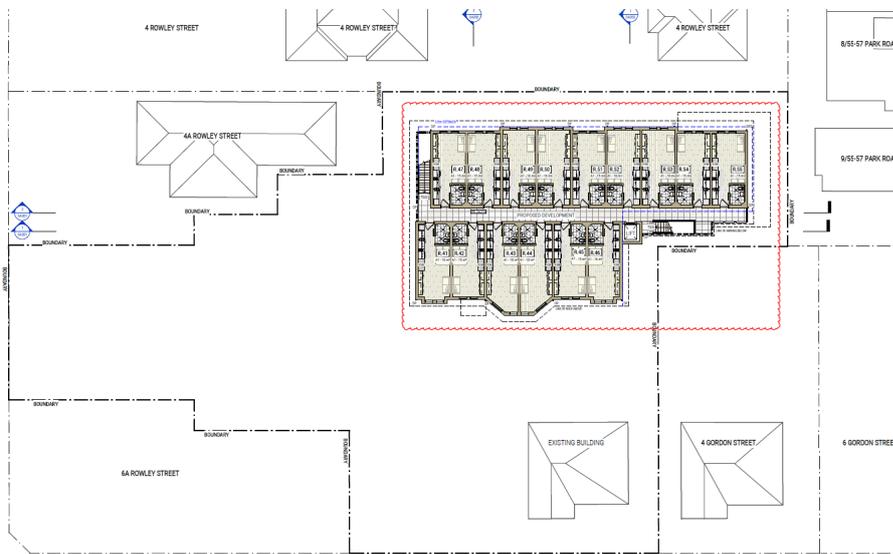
Proposed level 2 plan showing the modified scope clouded in red. (Source: Extract drawing DA102, Walsh Architects)
